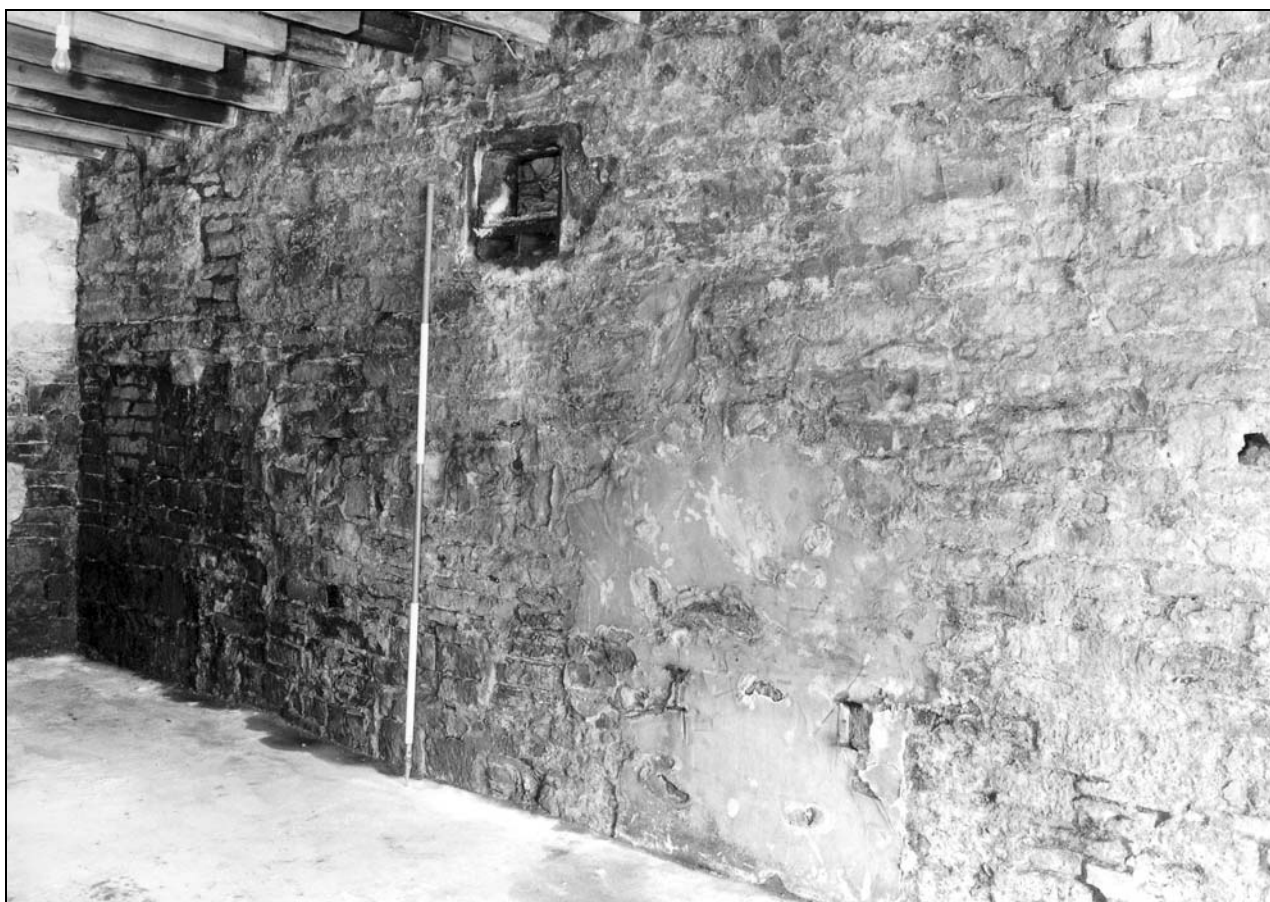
Building 1: west side of west ground floor room (film 2, frame 8)
